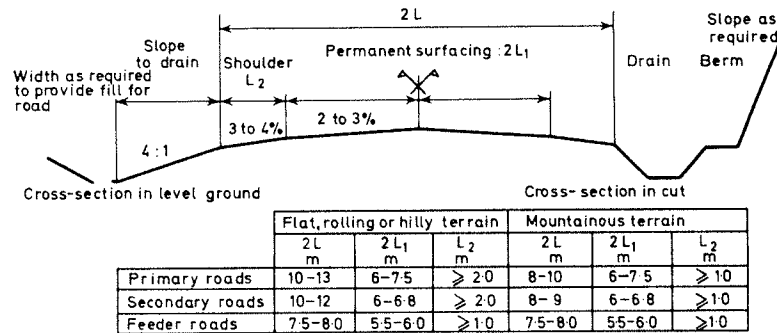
Typical standard cross-section of road. Formation width $2L$.
